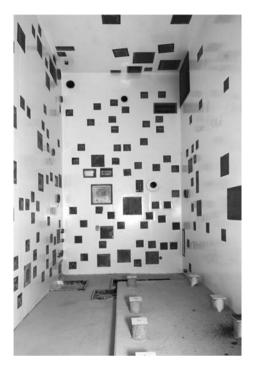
OL3, Wall view with embedded parts in the UFA building [22]
